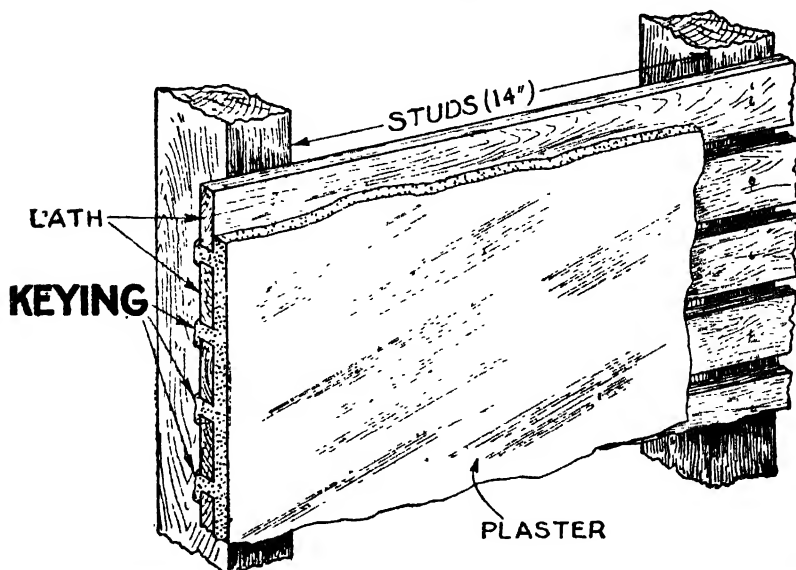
,446.—Section of plastered wall illustrating *keying*, or locking secured by the plaster projecting back of the laths.
